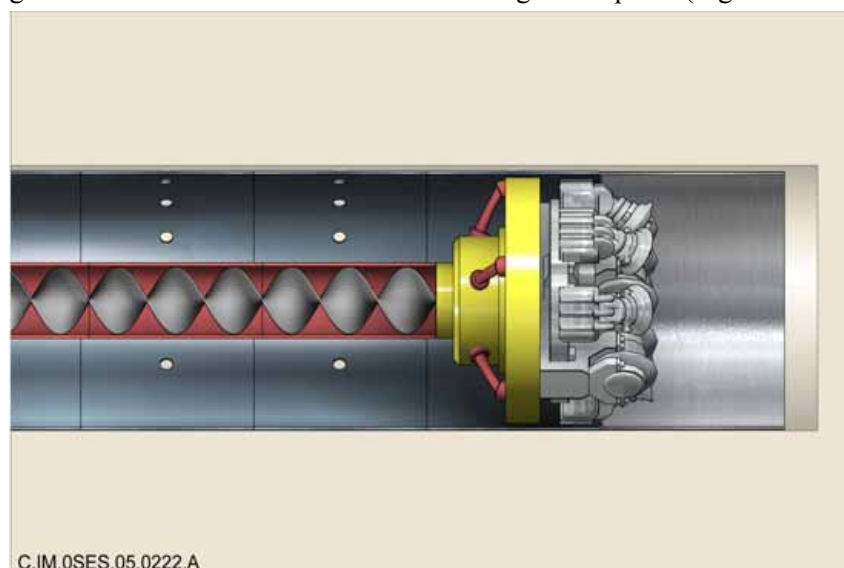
Cutting wheel (cutters pivoted) being retracted inside the lining
